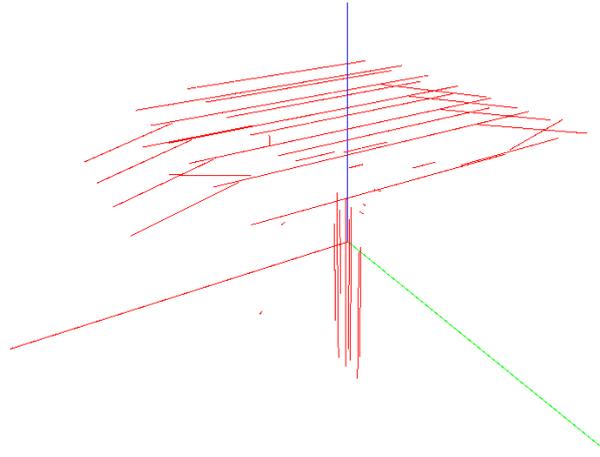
Strut and Tie Layout for Pier with Curved Pier Head
